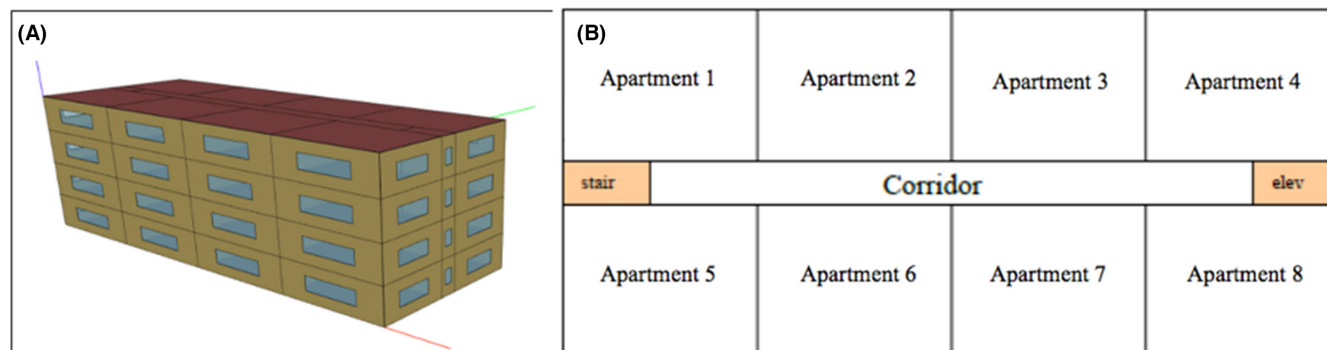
(A) EnergyPlus building model and (B) CONTAM floor plan for mid-rise multi-family building
